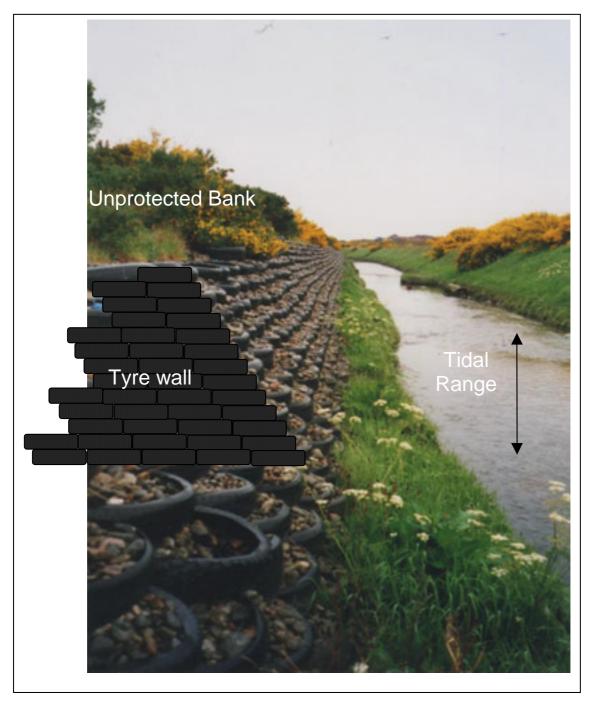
Example of a tyre wall reinforcement to embankment face
